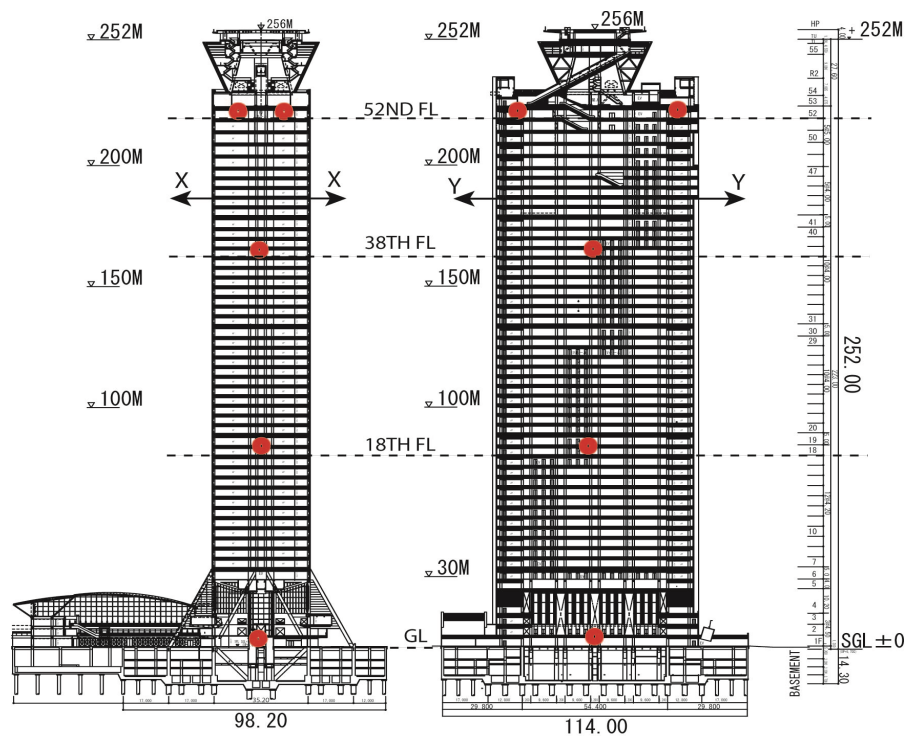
Vertical sections of the building showing major dimensions and locations of tri-axial accelerometers on the 52nd, 38th, 18th and ground level (1st floor). X and Y denote principal axes of the building (see Figure 2) [from Çelebi and others, 2012].
